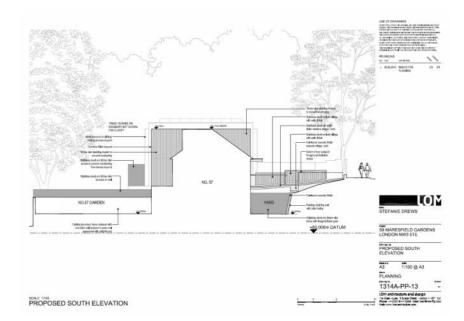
Proposed south elevation. NTS. Source: LOM Architecture and Design (2015).
